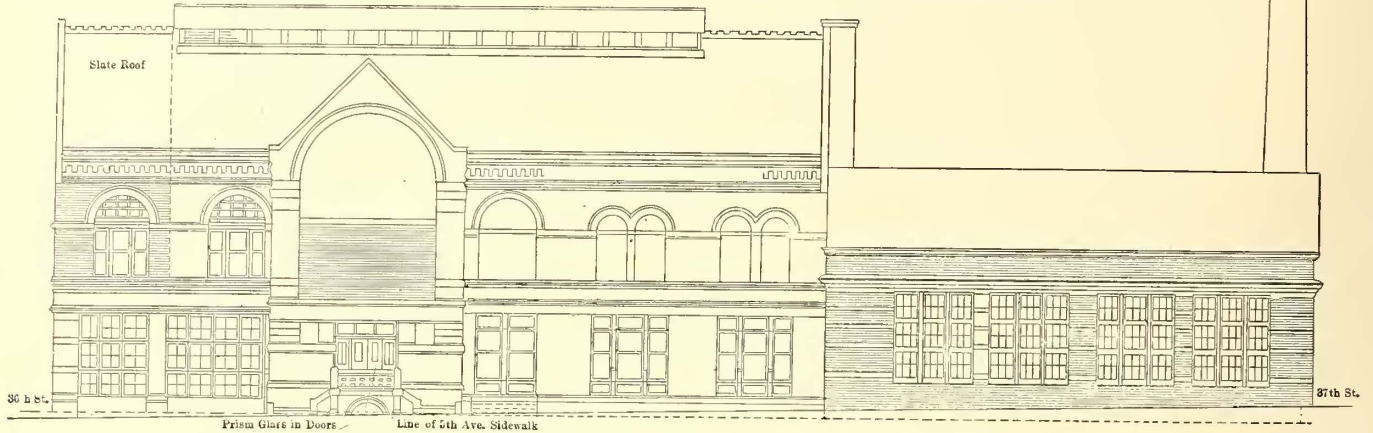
ELEVATION ON FIFTH AVENUE, SHOWING OFFICE BUILDING AND END OF MACHINE SHOP
